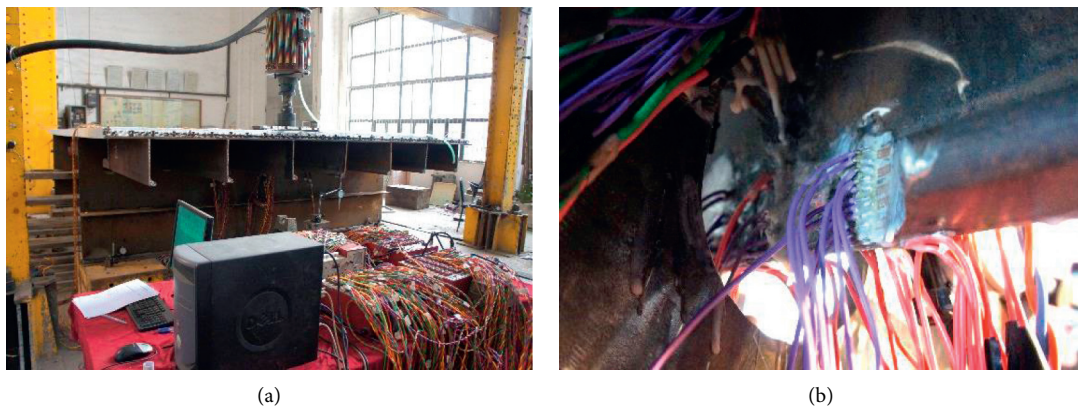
Fatigue test: (a) the specimen and test setup; (b) the strain gauges deployed on the tested specimen.
